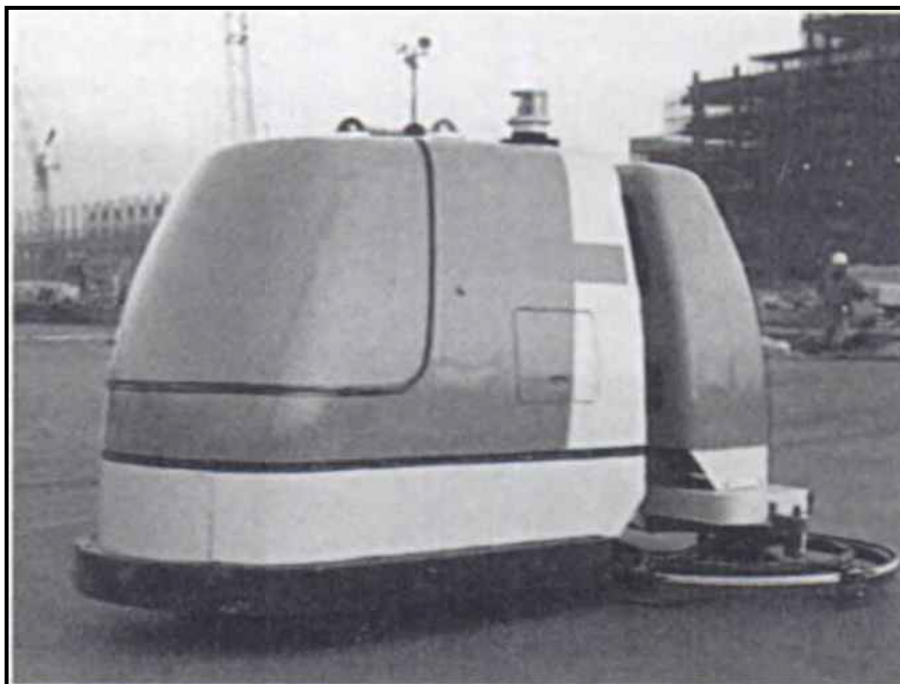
Obayashi's robot. *Construction Robots. The search for new building technology in Japan.
